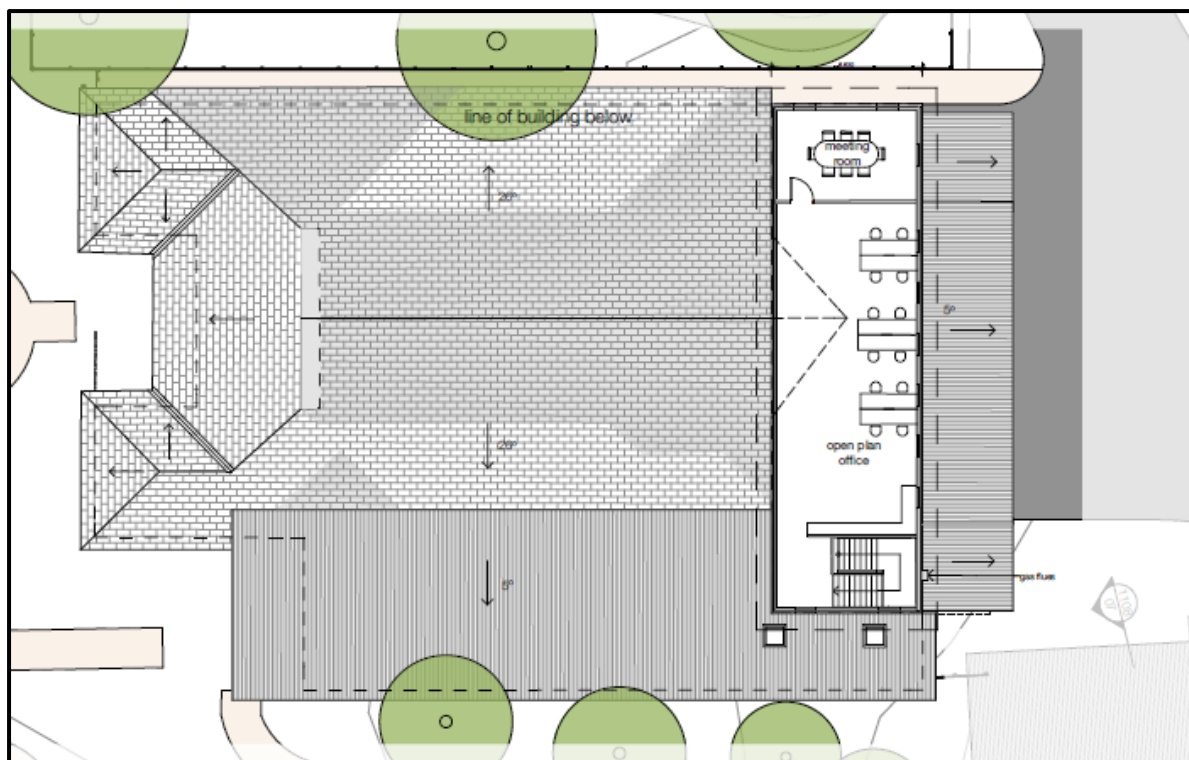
Approved B1 First Floor Plan for DA-1183/2016
